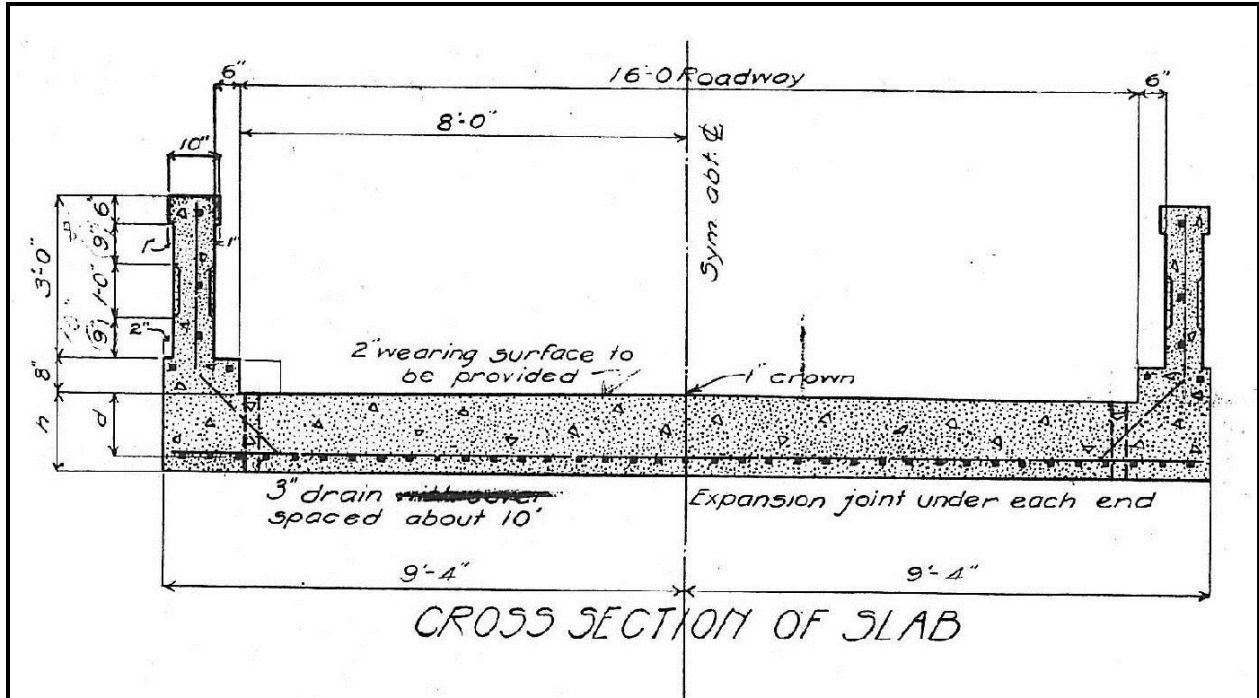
Cross Section of 1916 Concrete Slab Bridge Designed by West Virginia Division of Highways
